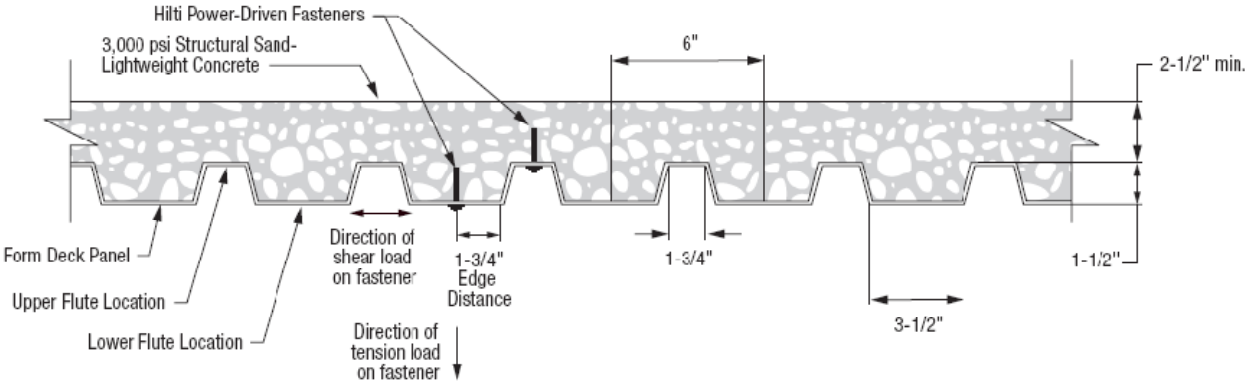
HILTI FASTENER LOCATIONS IN 1 1/2-INCH-DEEP COMPOSITE FLOOR DECK PANEL, NORMAL DECK PANEL PROFILE ORIENTATION
